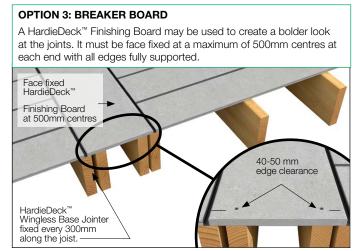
C DECKING BOARD BREAK-A-BOARD BUTT JOINTS
